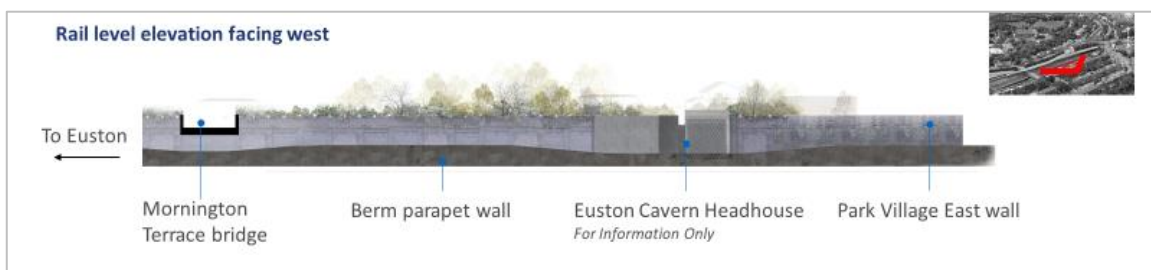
Rail level elevation of the PVE Wall Berm and upstand support structure
